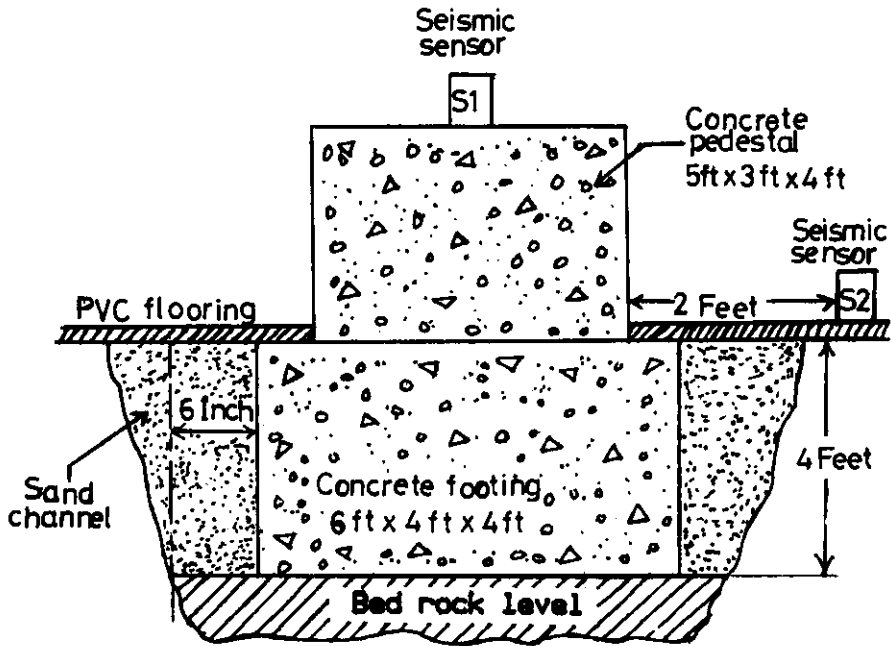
Layout of typical concrete pedestal cast over bedrock.
